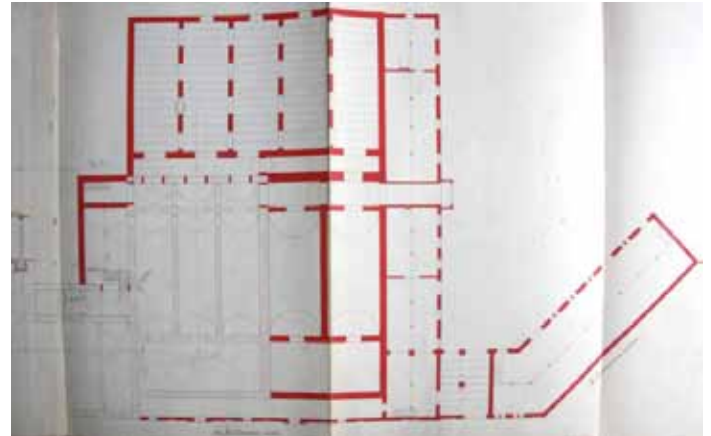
Plan of the basement floor with ice-cellar. 1904. Architect P. M. Bertschy. [2]
